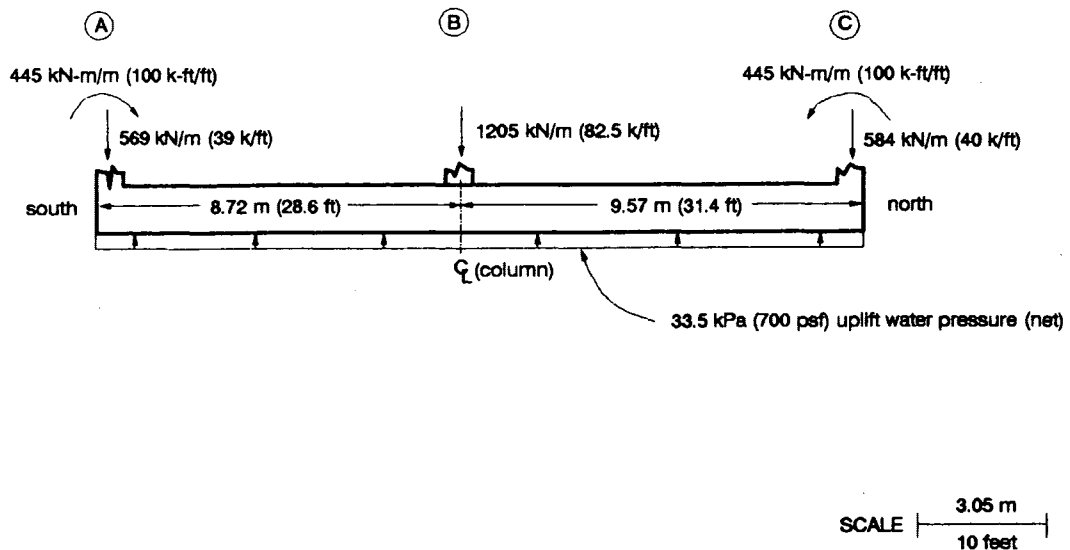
MIT Whitaker Laboratory—Transverse section through mat foundation.
